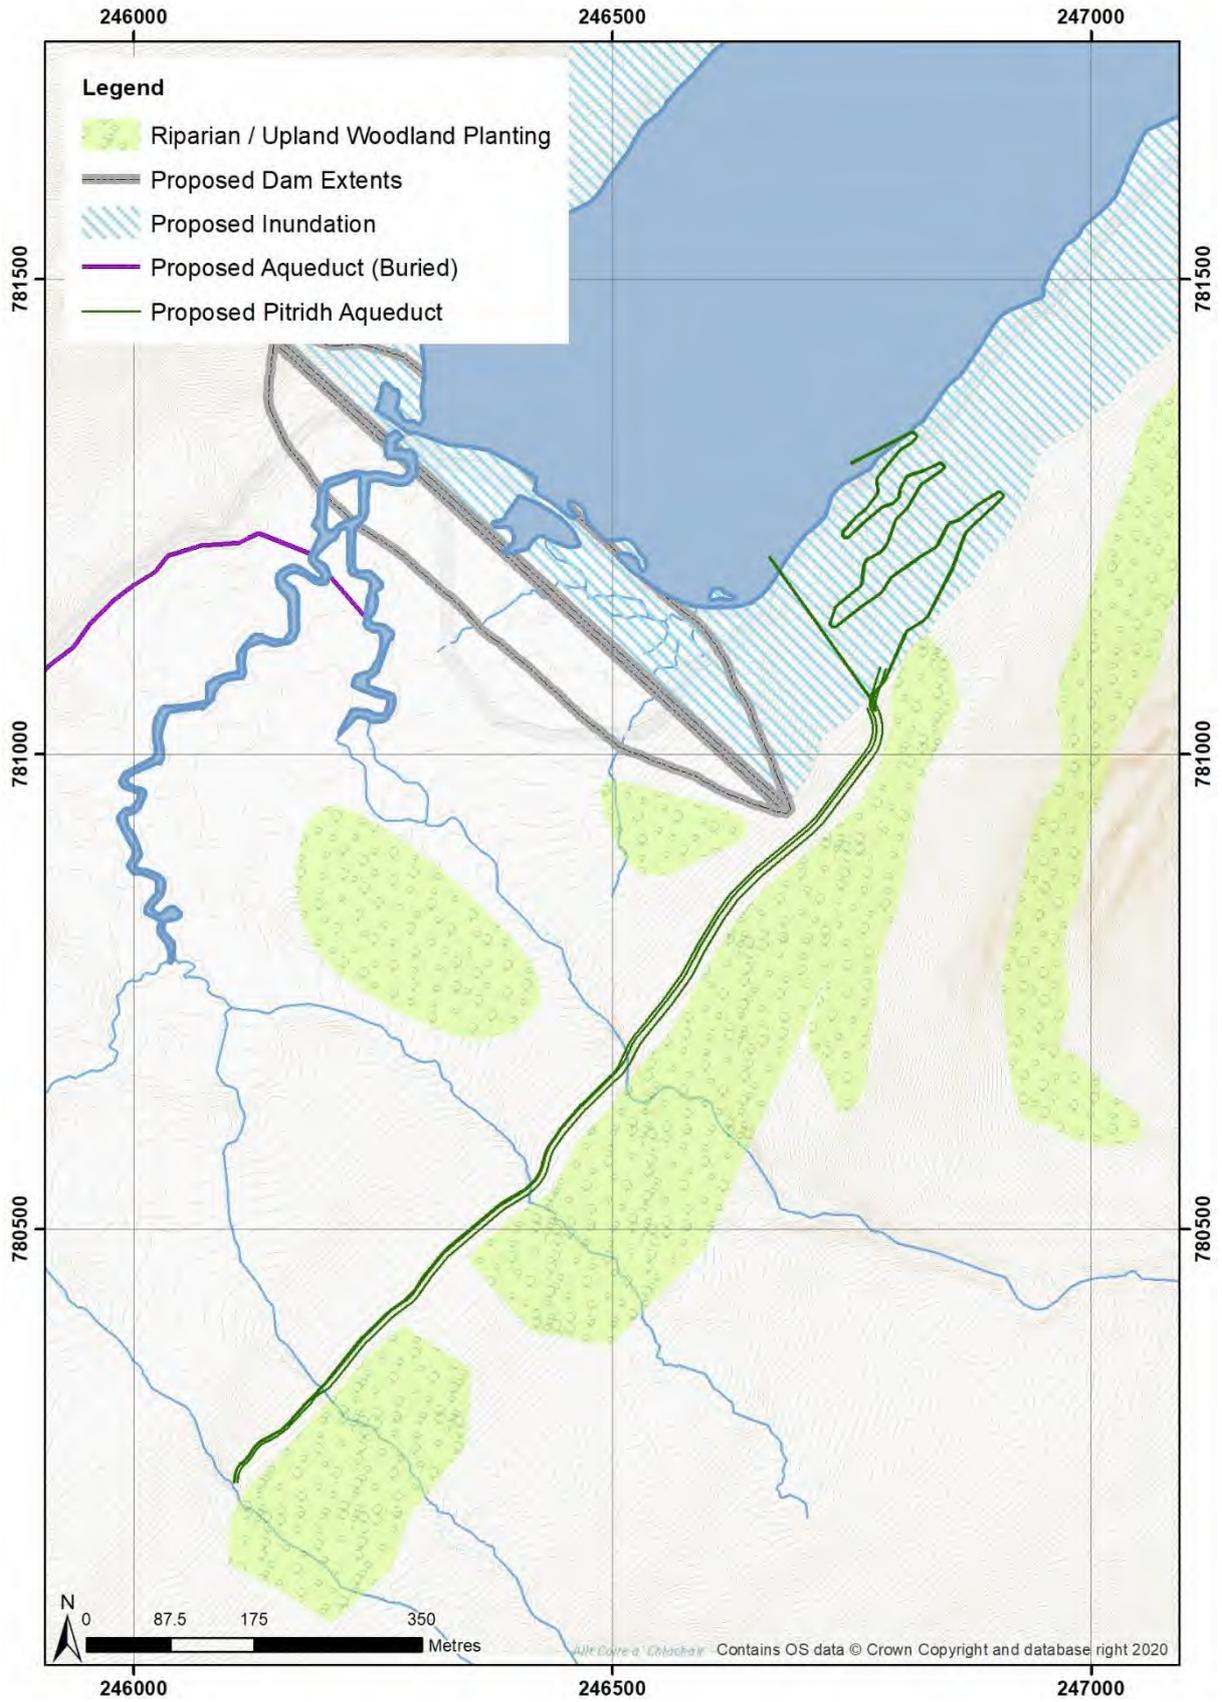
Proposed Pitridh Aqueduct and woodland planting
